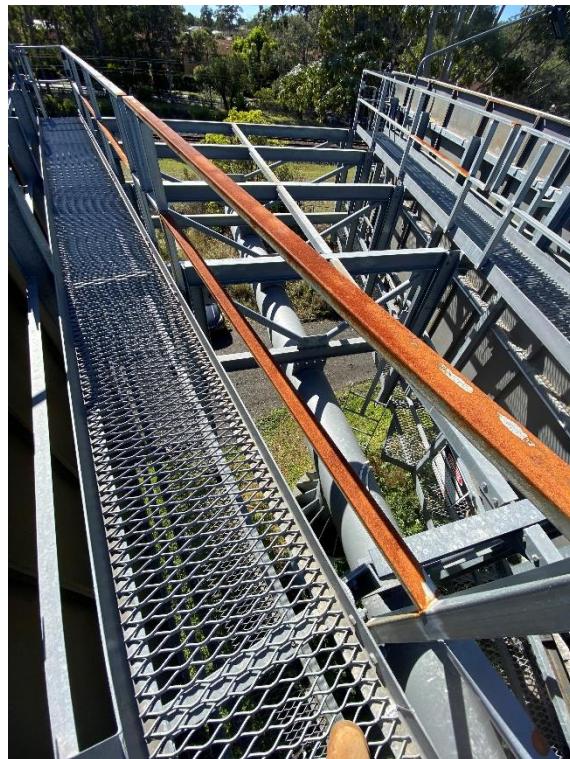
Surface corrosion to handrailing (outbound side).
